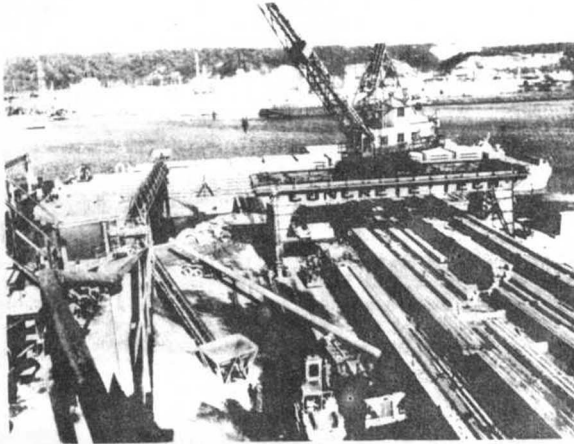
Modern prestressing plants produce prestressed concrete products of very high quality. Shown are very long octagonal piles being shipped out of Concrete Technology Corporation's plant in Tacoma, Washington. 36,416 ft (11,100 m) of piling went to Adak, Alaska, along with 440 deck panels to construct the Naval Supply Pier (Prestressed Concrete Institute).
